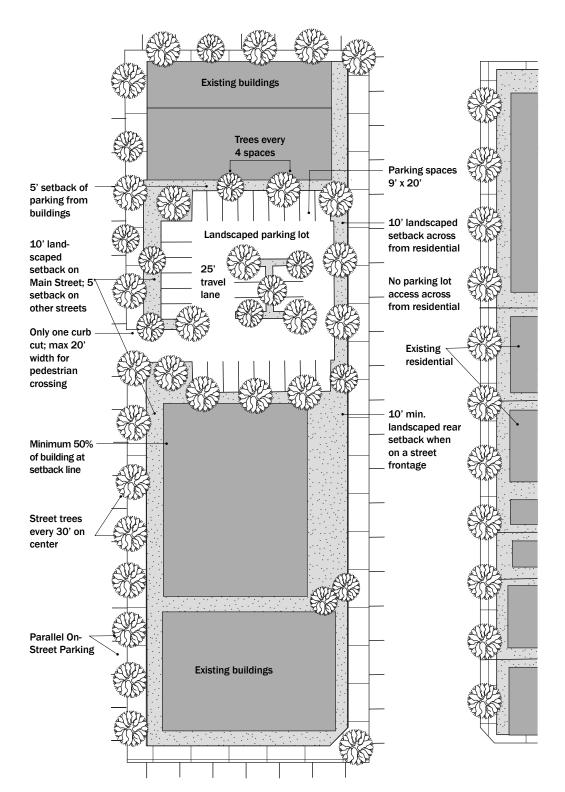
Downtown Retail South: Building Form and Site Planning
